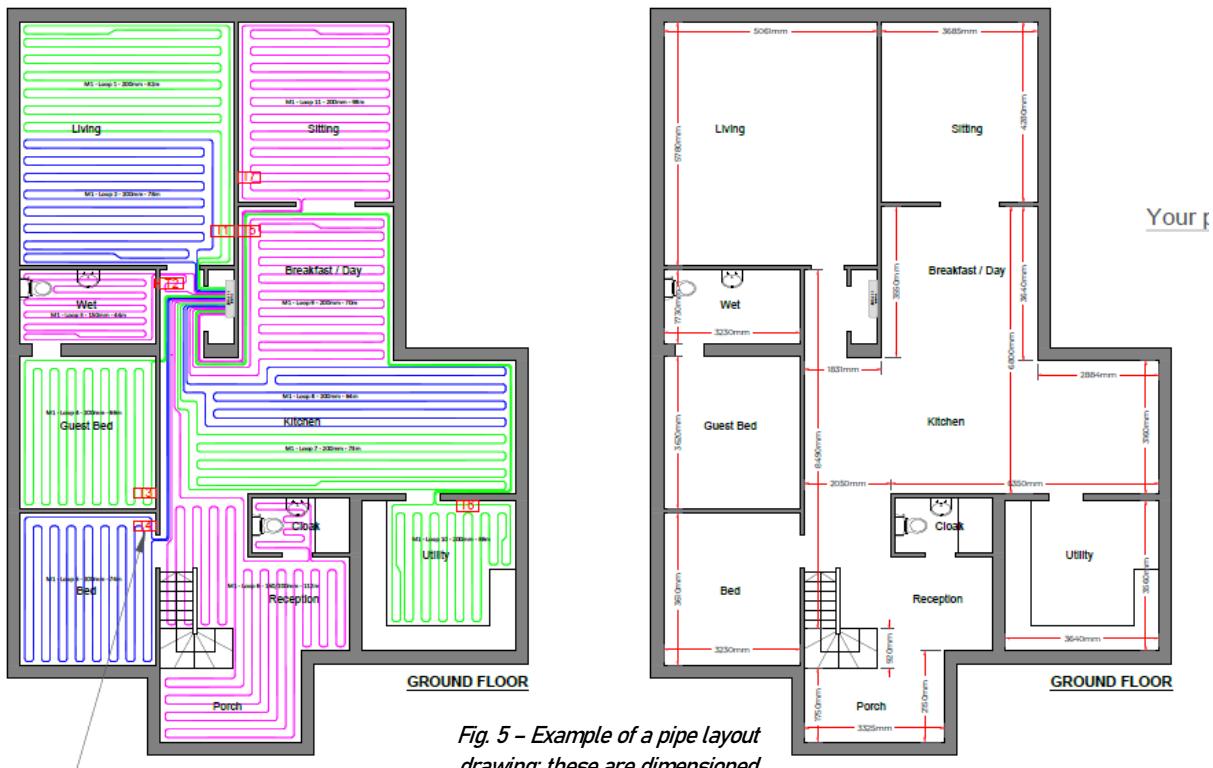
Example of a pipe layout drawing; these are dimensioned and to scale for ease of reference.
